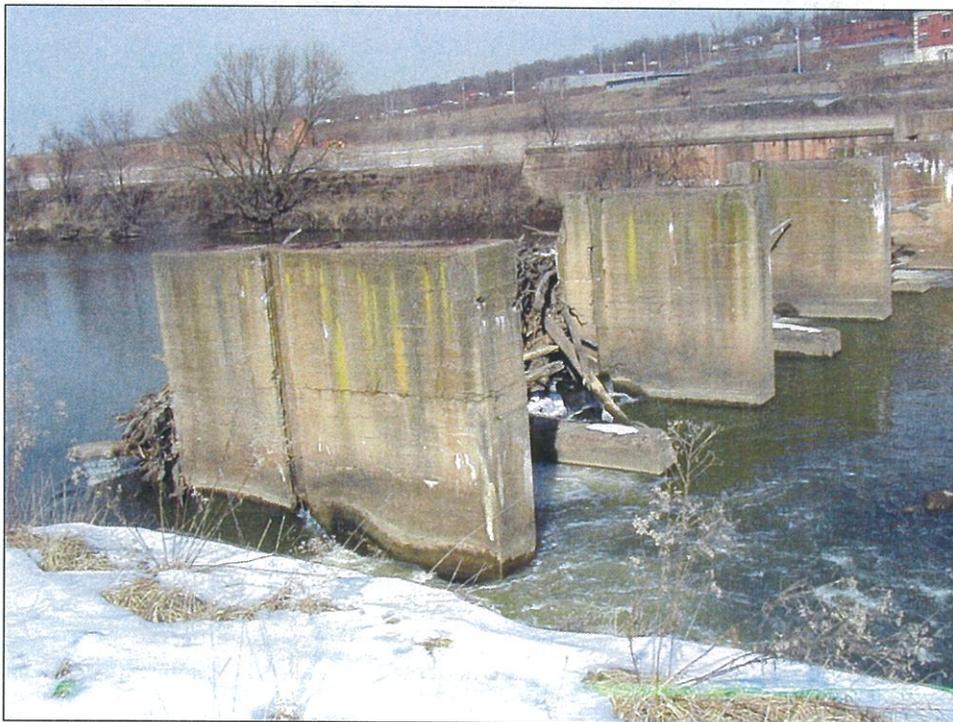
Pier detail looking southeast, YS & T Coke Trestle and Dam, Struthers.
